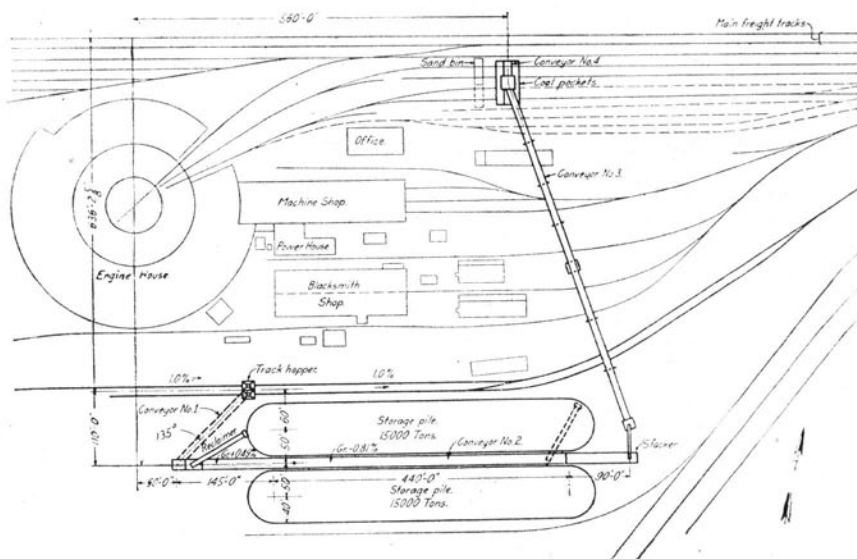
PLAN OF COAL STORAGE PLANT OF THE ERIE RAILROAD, BUFFALO, NEW YORK
